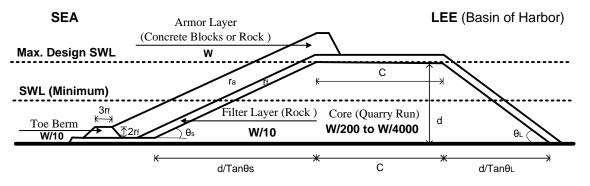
Proposed typical section for breakwaters of a typical harbor
